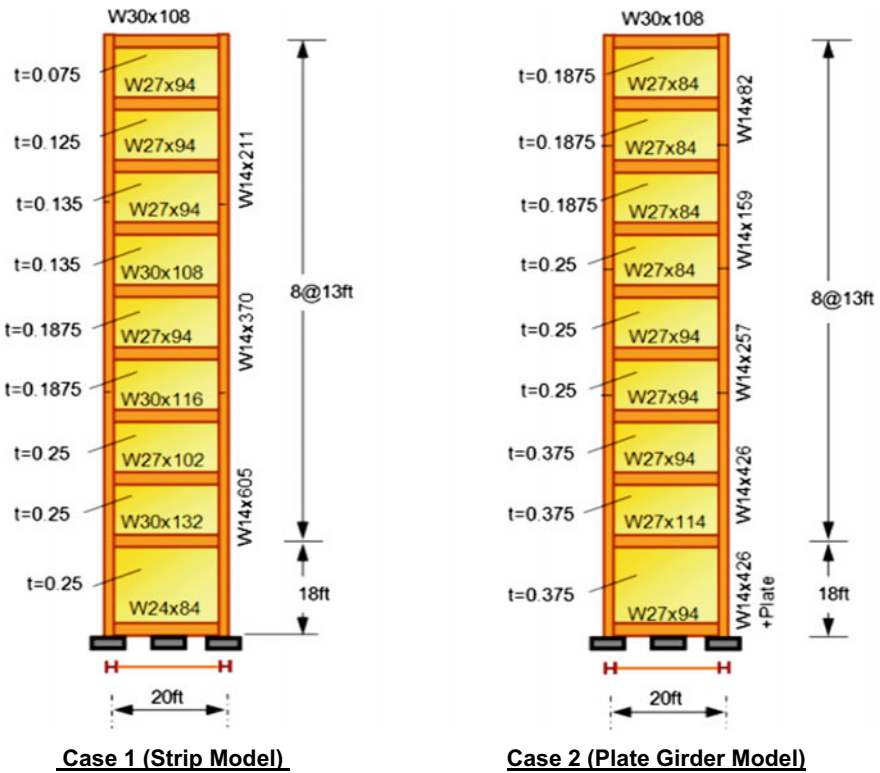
Shear wall designed using “strip model” (left), and plate girder model (right) (Shi and Astaneh-Asl 2008)
